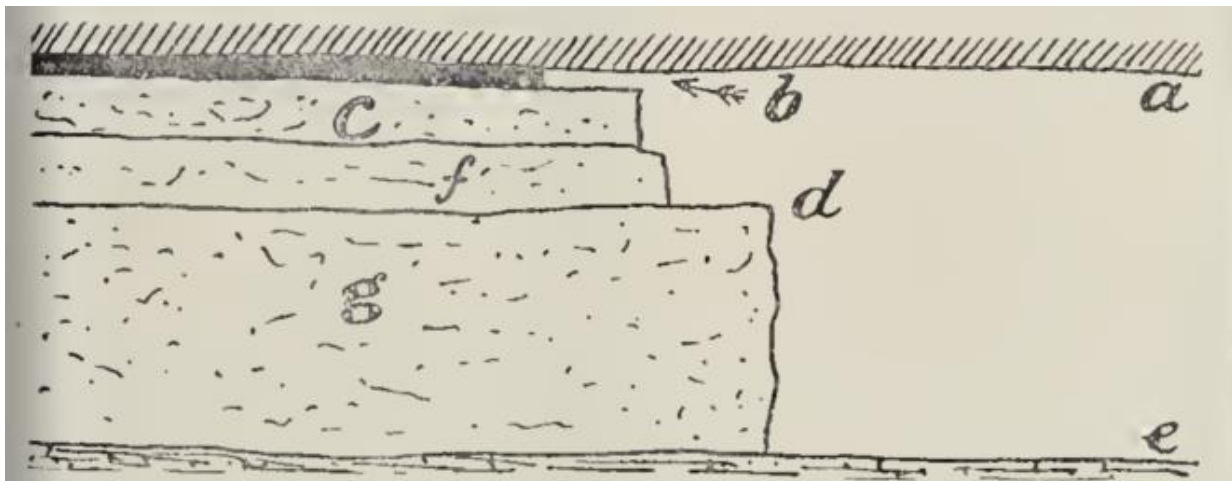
Section of heading underground, showing method of quarrying Bath stone.
